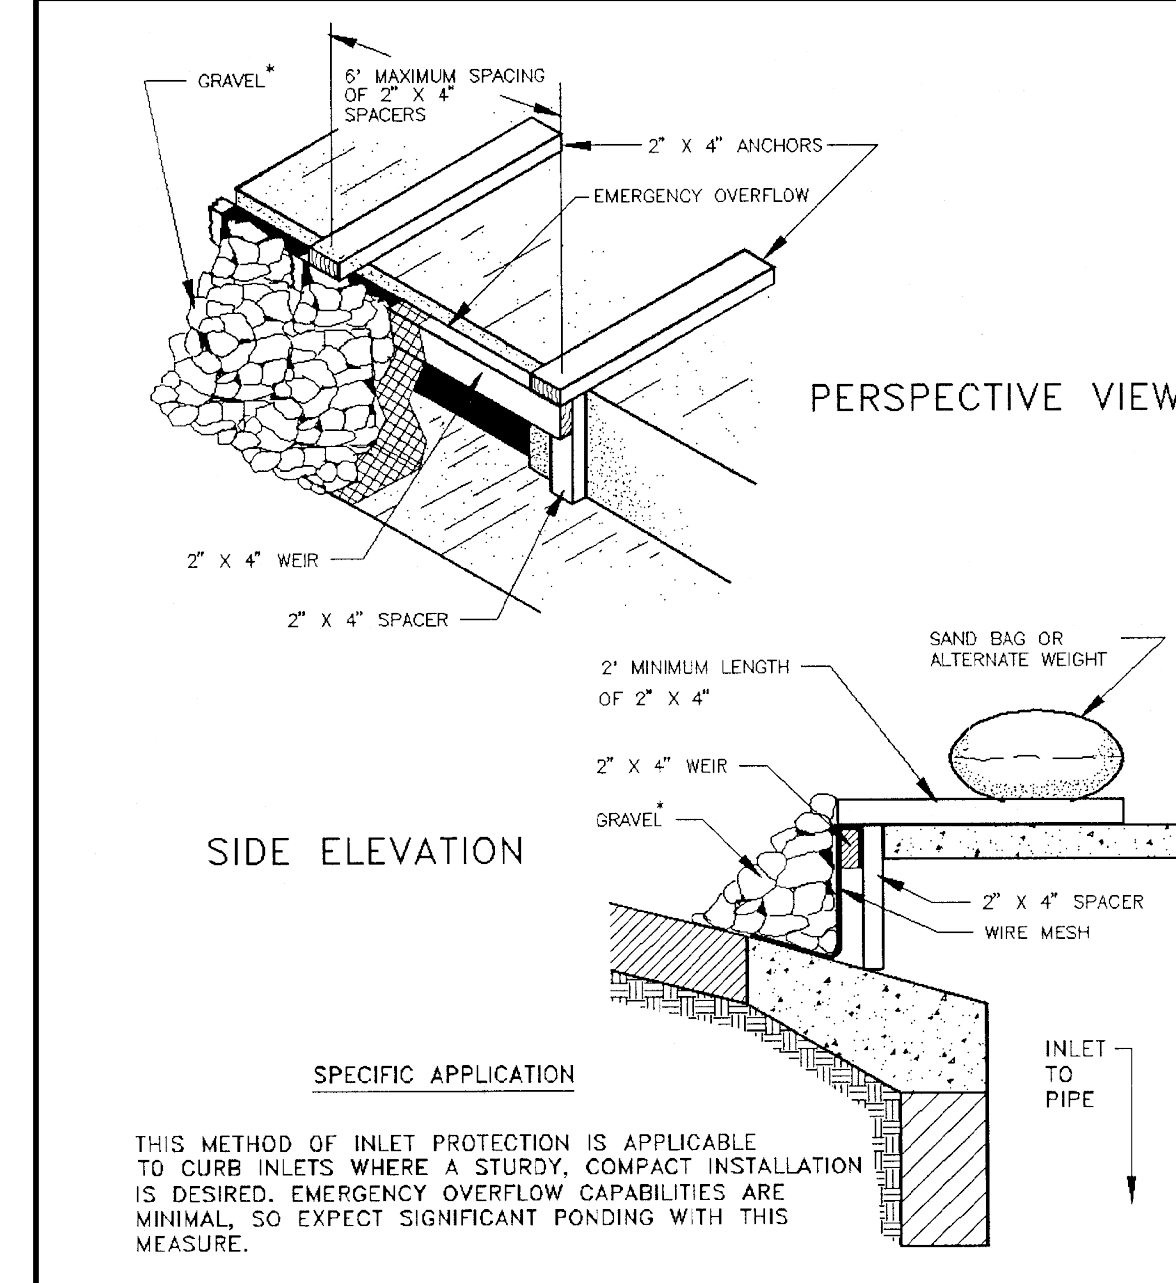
Wooden Weir Curb Inlet Protection (VA Dept of Conservation, 1992)
